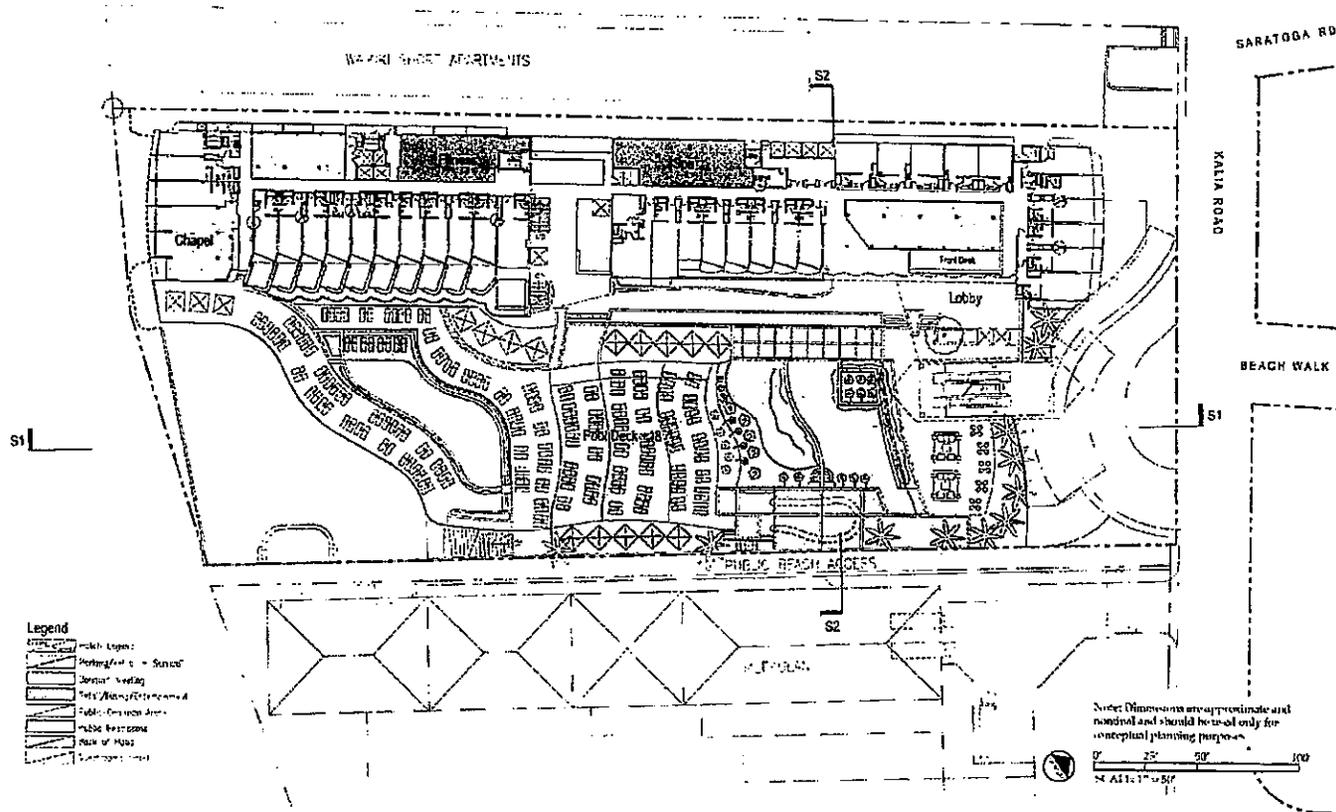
Floor Plan (+15 to +18 - Lobby/Pool Deck Level)
